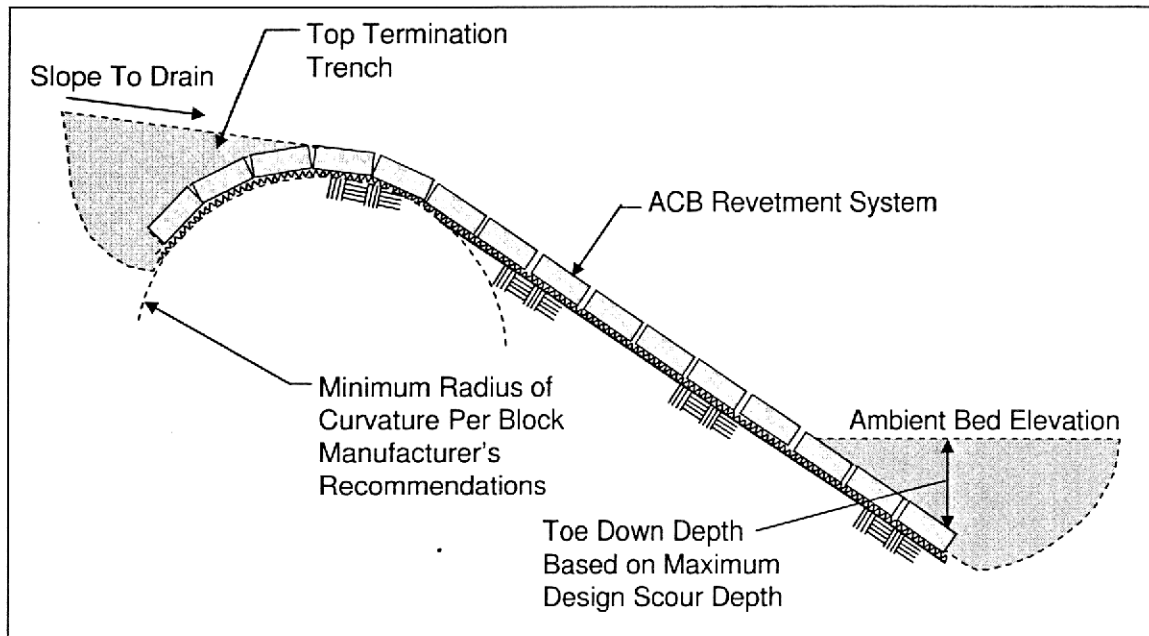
Recommended layout detail for bank revetment where no bed armor is required.
